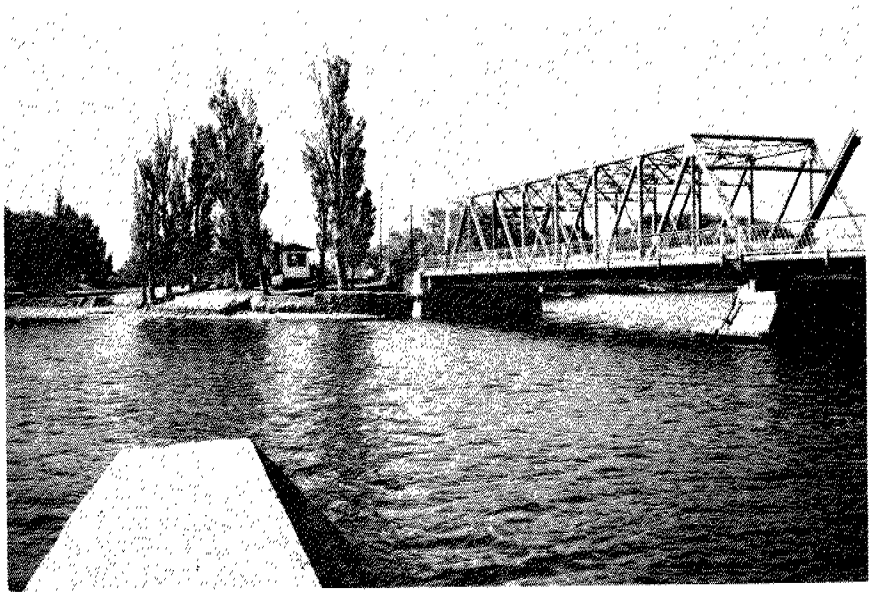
(LOOKING SOUTH FROM EAST SWING STOP PIER)
